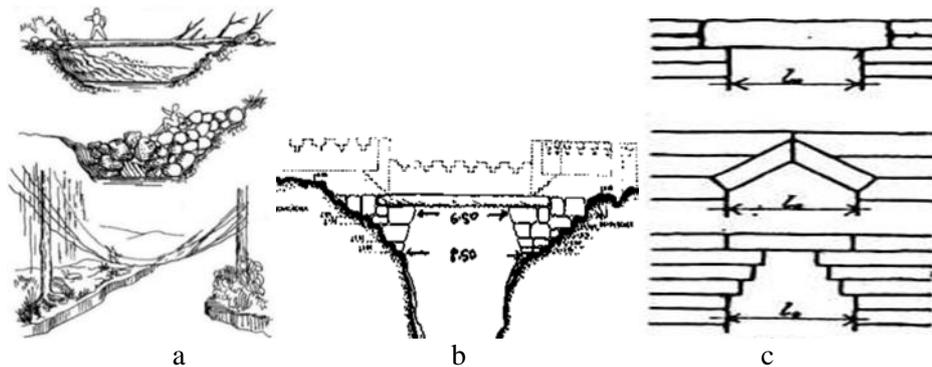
Primitive bridge examples a) Simple wooden beam [13], b) Wooden cantilever [10], c) Overlap cantilever [10]
